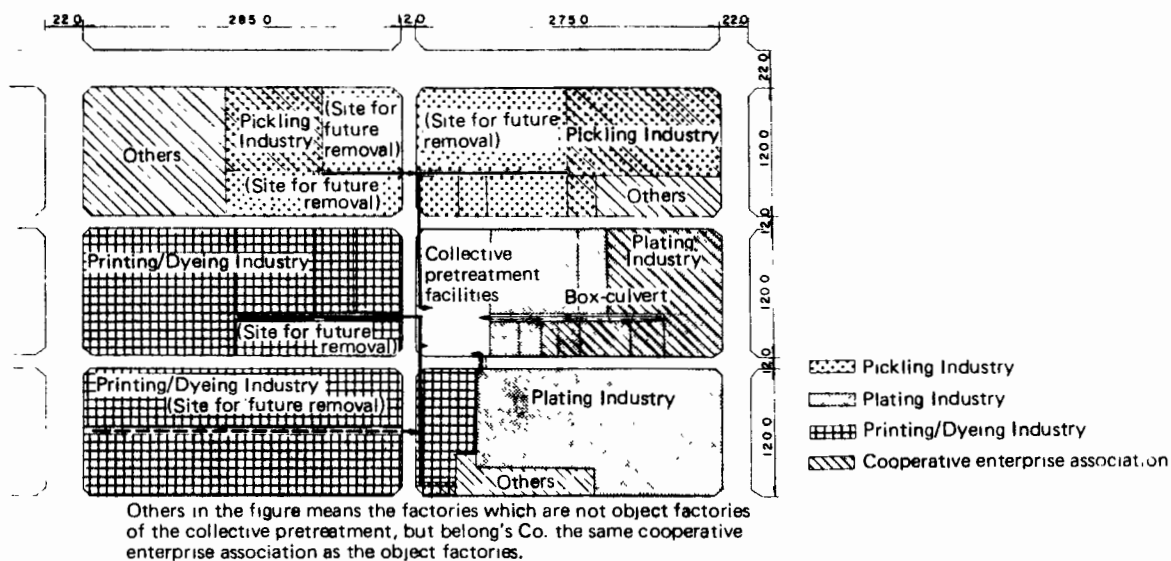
Plan view of the planned arrangement of drainage pipework of factories and pretreatment facilities and sewer planning in the collective pretreatment area
